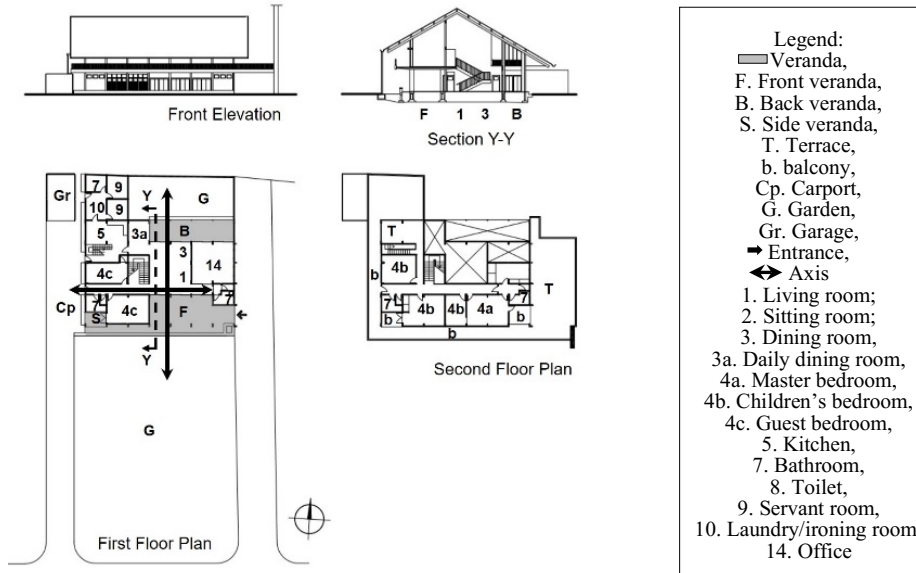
House of T.D. Pardede (1960)⁴⁾
